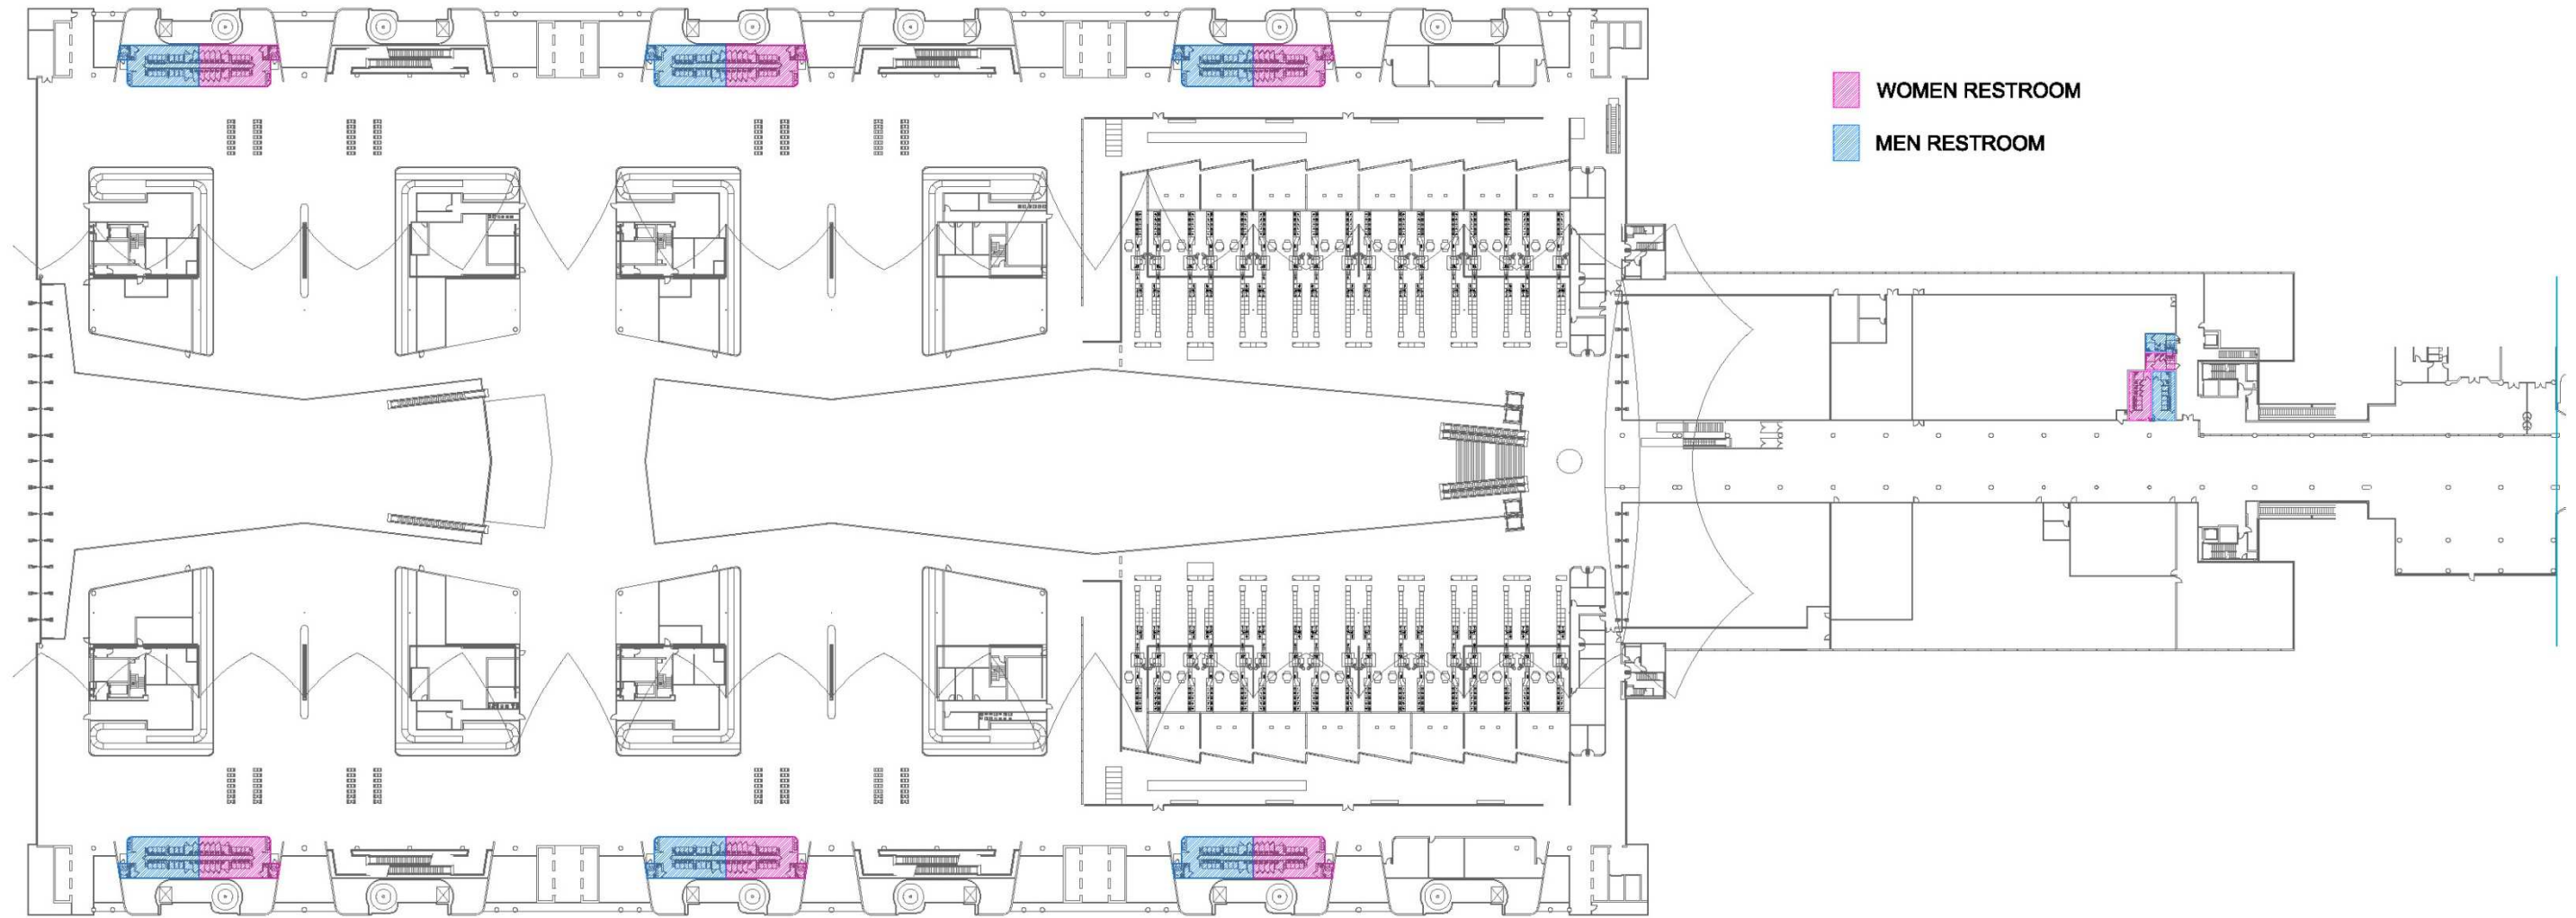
(a) – Level 6 Restroom Facilities
